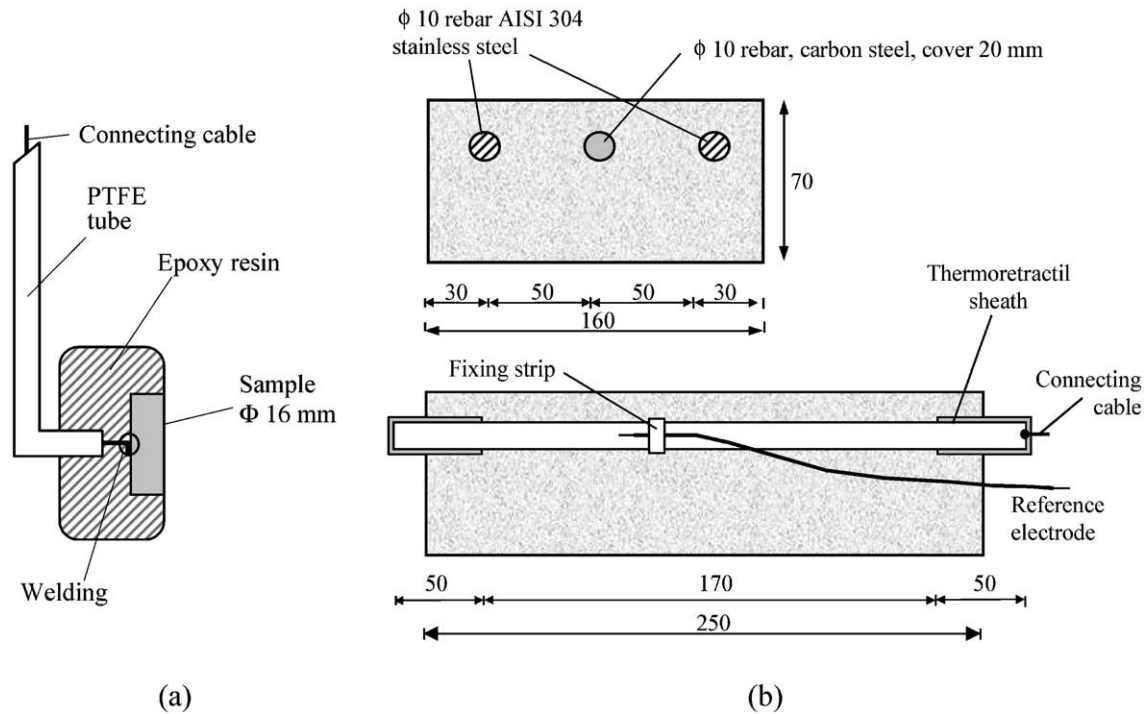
Solution test specimen (a) and reinforced concrete specimen (b).
